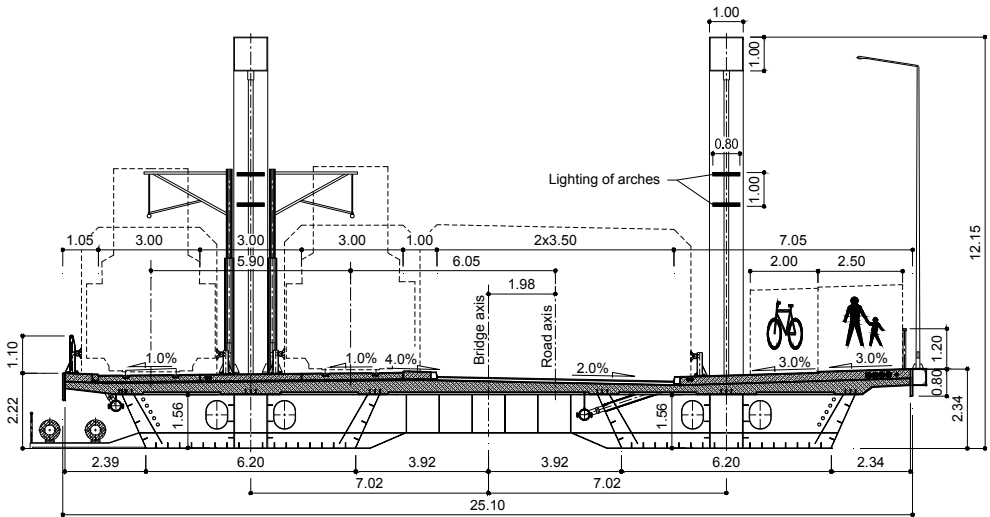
Cross-sections of the eastern Warsaw Bridge in the main span
